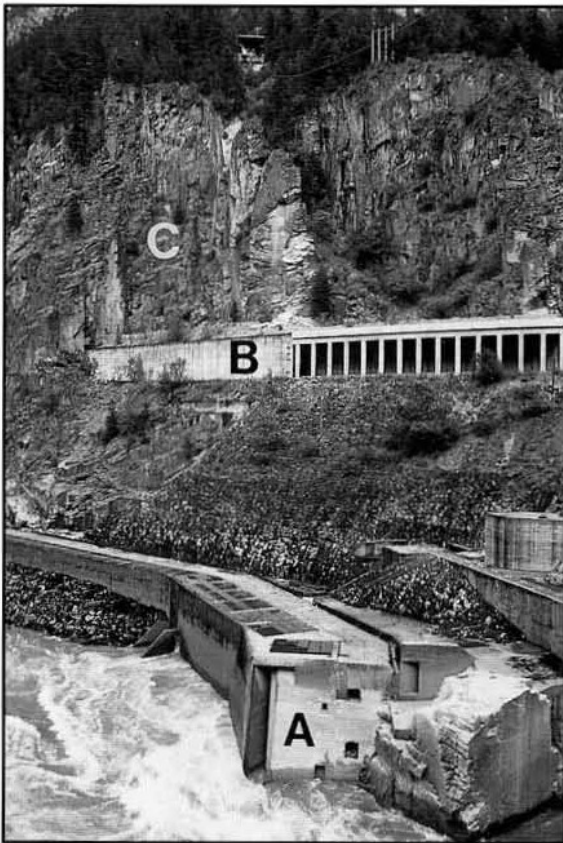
View of Hell's Gate fishways, A) looking upstream from the west bank of the Fraser River in 1985. Note Canadian National Railway rockfall protection structure, B) and steep jointed rock slope of Fraser Canyon wall above C) source of 1914 rockfall. GSC 1994-709B
